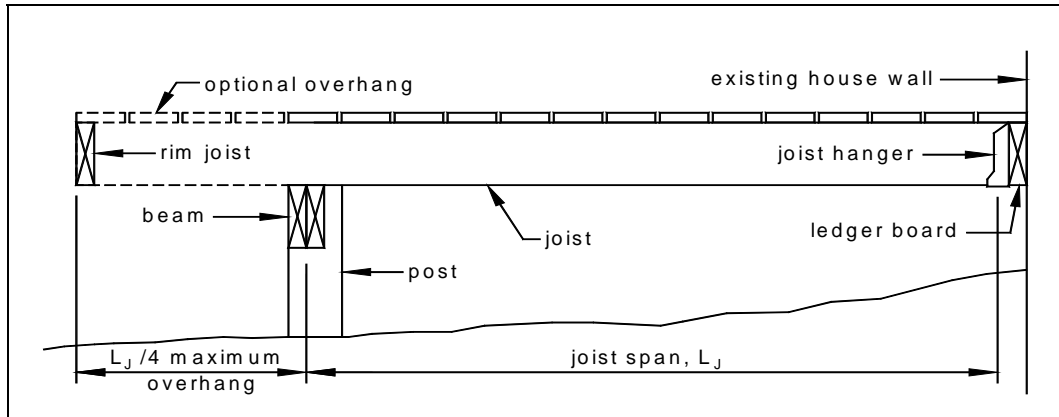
JOIST SPAN - DECK ATTACHED AT HOUSE
